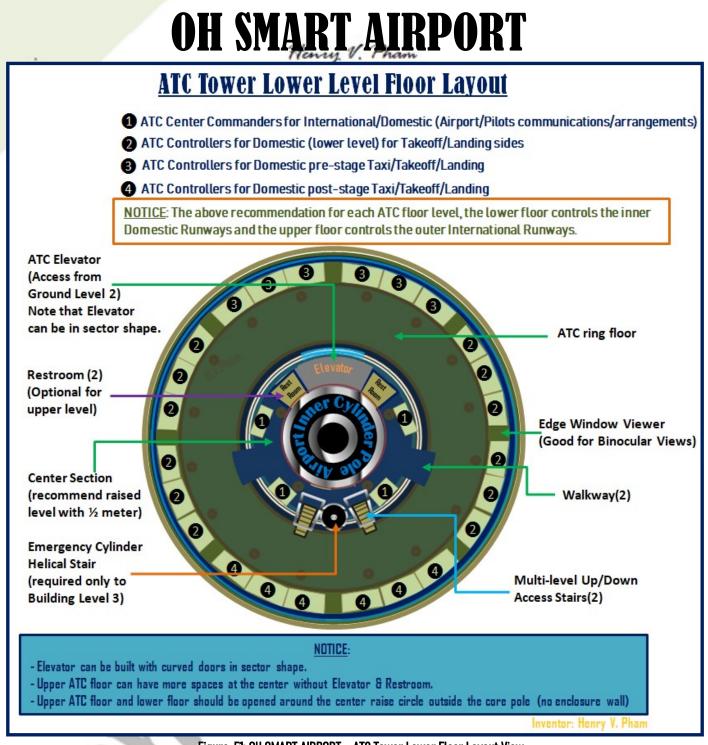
OH SMART AIRPORT - ATC Tower Lower Floor Layout View
